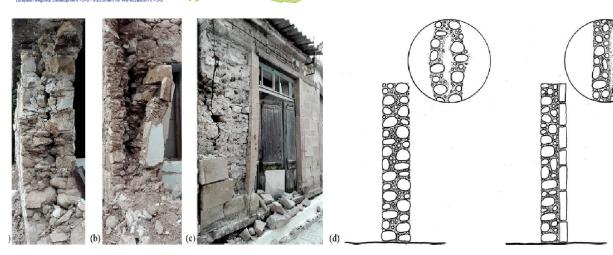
Typical multi-leaves wall sections with lack of transversal interlocking stones (Vlachakis, 2020)
